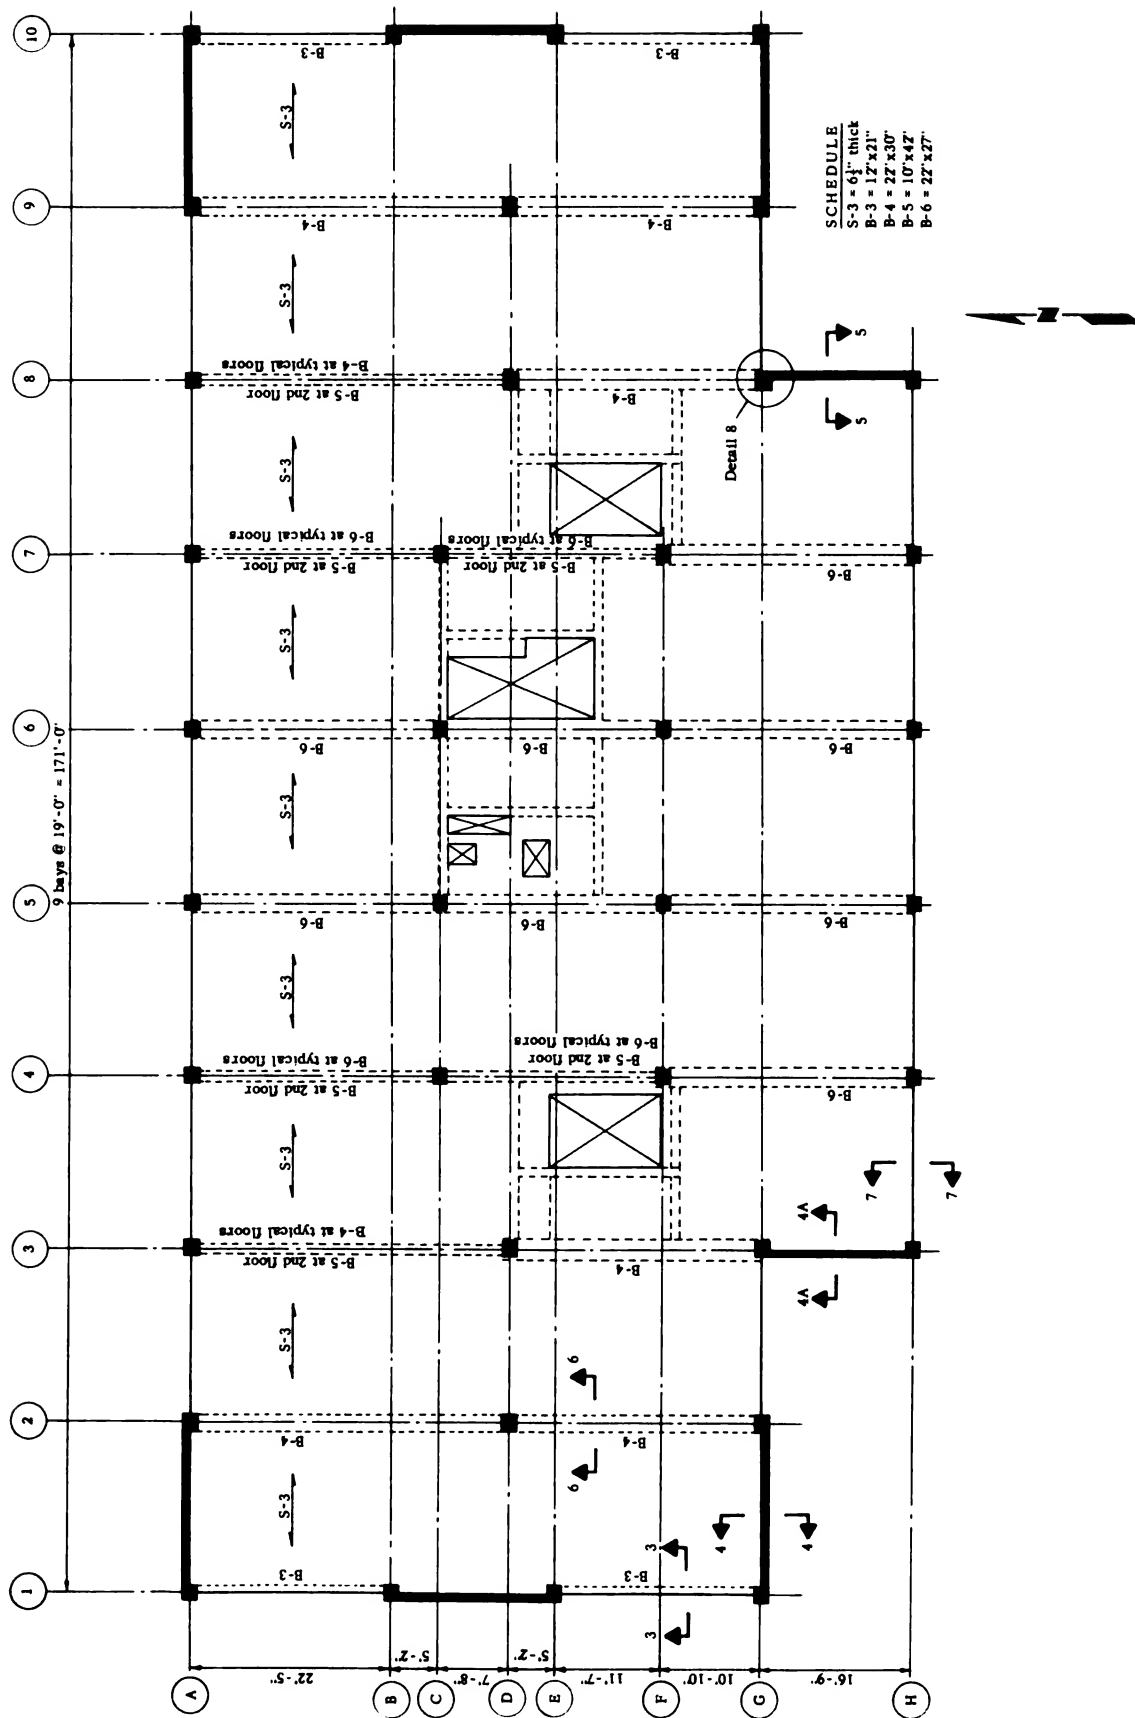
Indian Hills Medical Center. Second-floor framing plan. Third, fourth, fifth, and sixth floors are similar.
